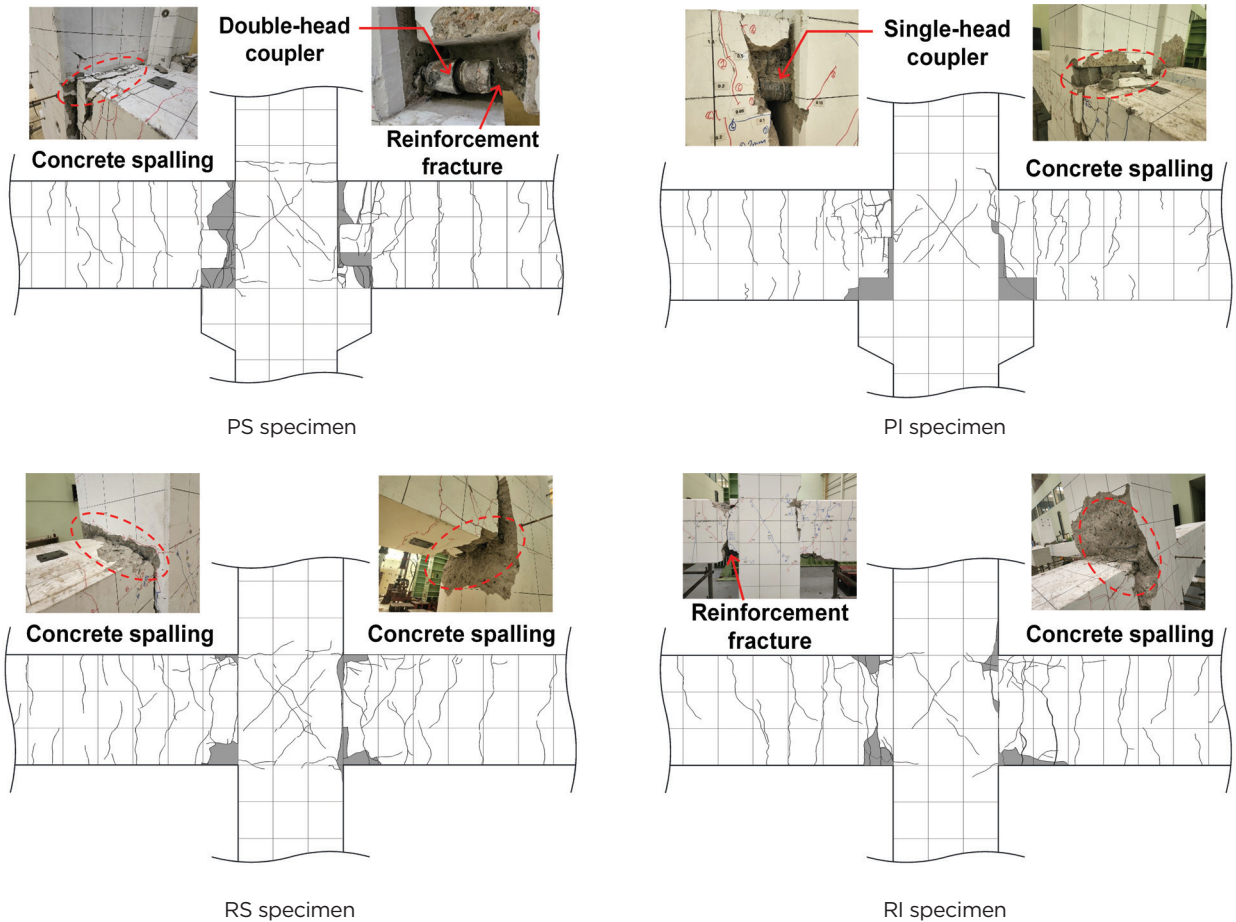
Ultimate crack patterns and failure modes of test specimens. Note: PI = precast concrete intermediate moment frame system; PS = precast concrete special moment frame system; RI = cast-in-place concrete intermediate moment frame system with monolithic connection details; RS = cast-in-place concrete special moment frame system with monolithic connection details.
